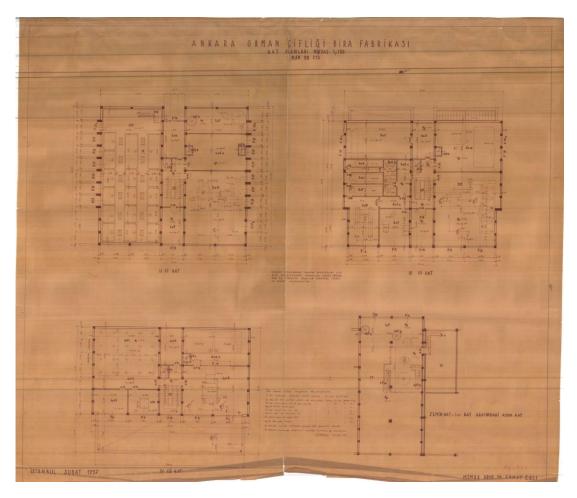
Original drawing of the boiling and fermentation building, plans, Ernst Egli, 1937 (Source: TTA Archive)
